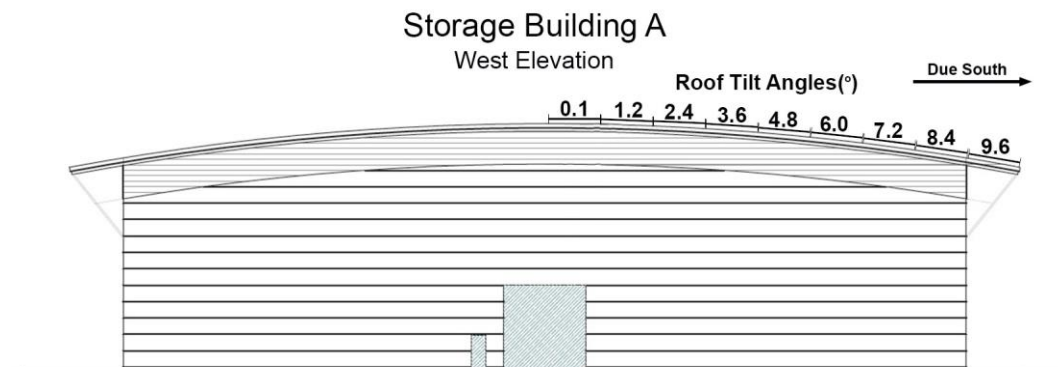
Tilt angles of the curved roof section of Storage Building A used to calculate glint and glare
